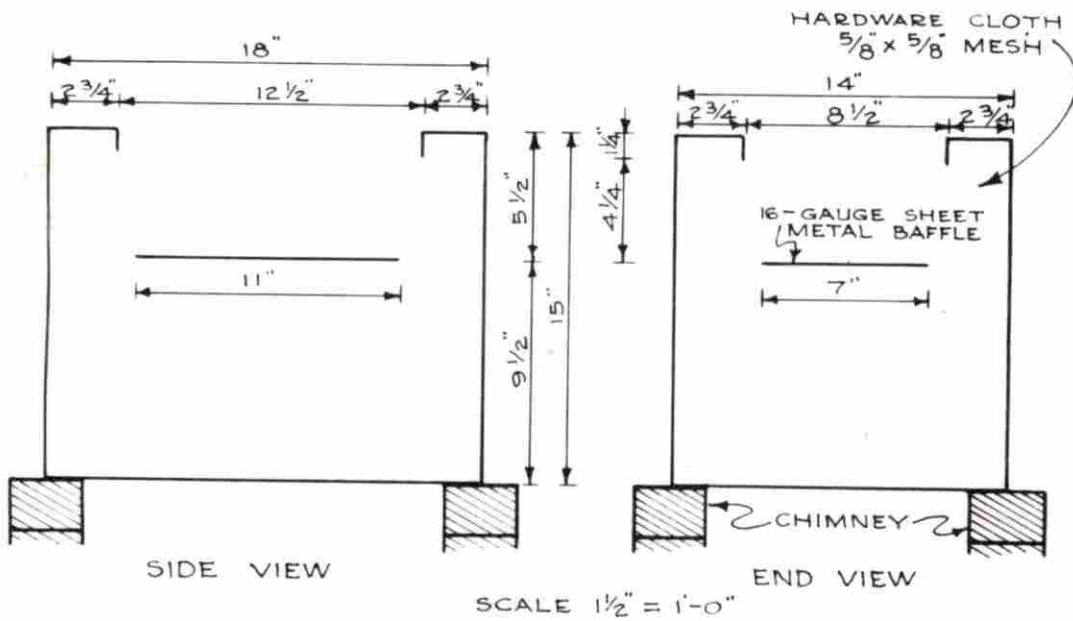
SECTIONAL SKETCH OF NO. 3 SPARK ARRESTER
